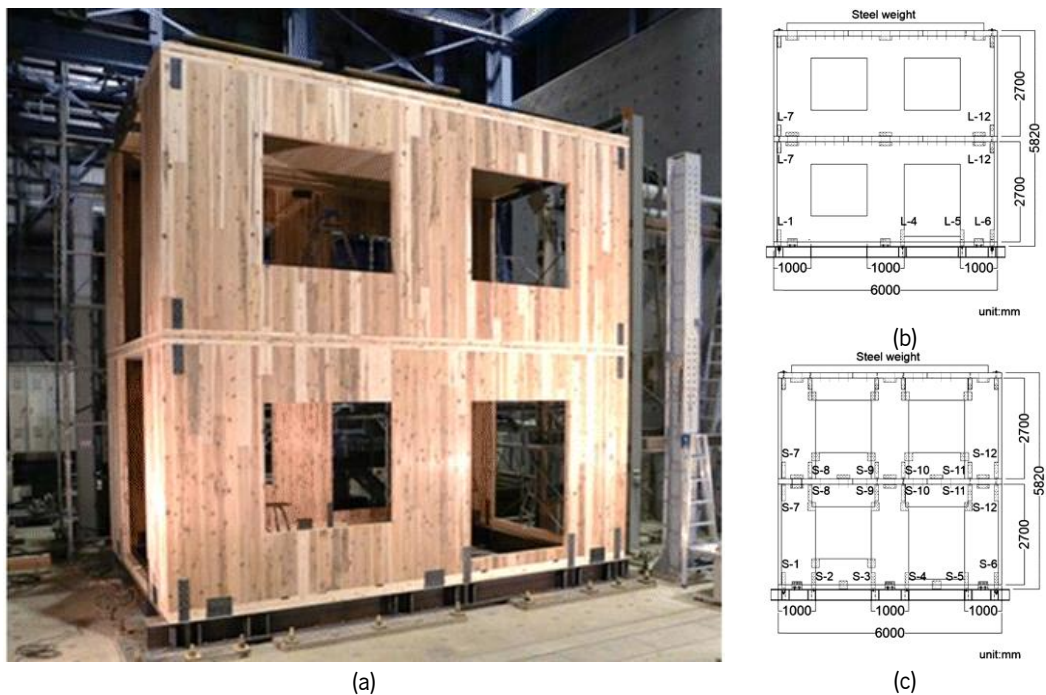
Panoramic image (a) and facade of the building with openings cut directly on the CLT panels (b) and facade of the building with openings trough segments (c) [29].
